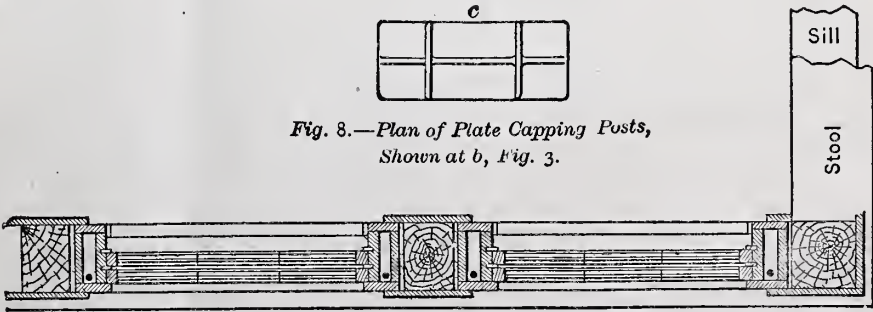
Horizontal Section, Monitor Window.—Scale, 1/2 Inch to the Foot.
